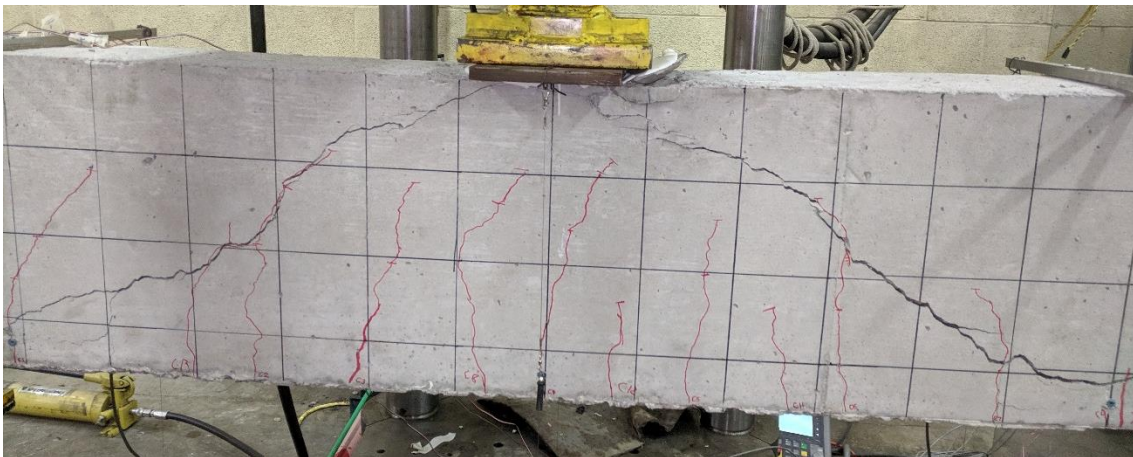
BM 4.5-N: Crack patterns at failure
